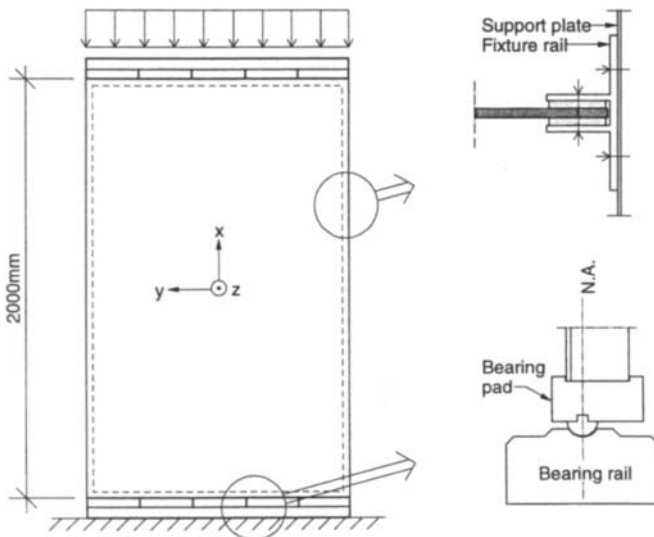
Test set-up, schematic view of simply supported plate specimen in test rig, detail of support arrangement at longitudinal edges (vertical) and detail of cylindrical bearings at loaded ends.
